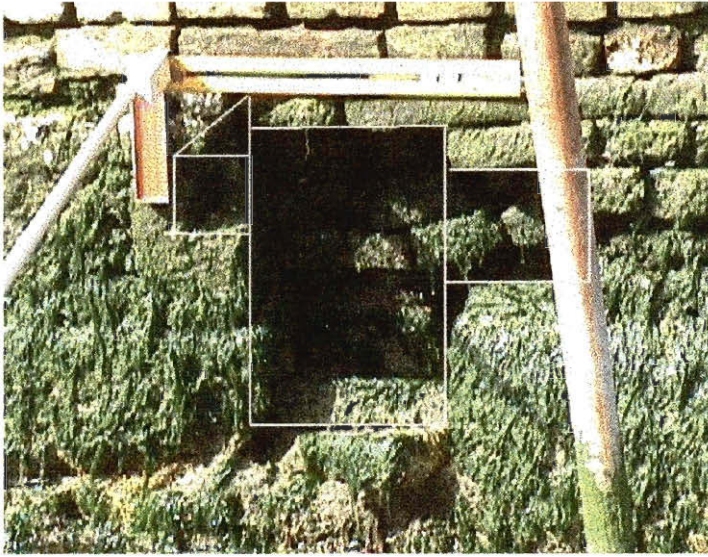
Damage on canal wall partitioned into basic geometric shapes for area calculation
